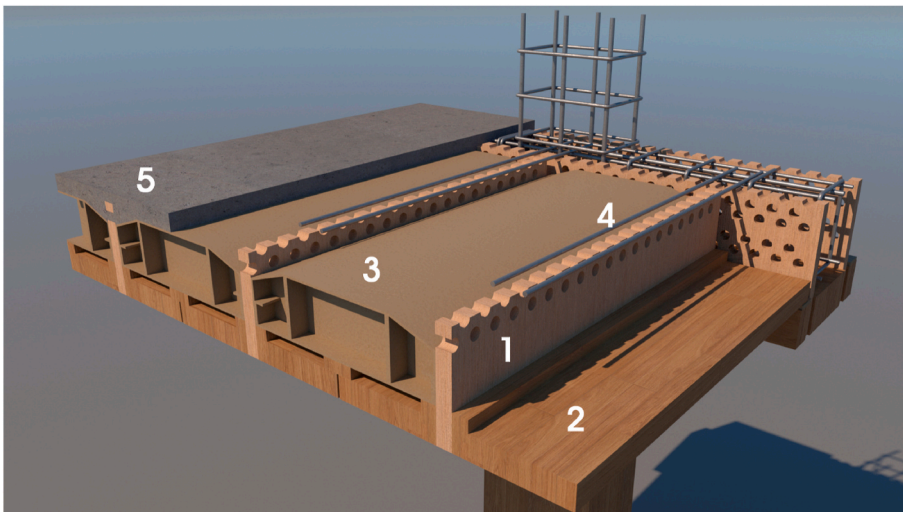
Three-dimensional model. Components of the flooring system: 1 plywood rib, 2 glulam flange, 3 in-fill blocks, 4 rebars, 5 concrete slab.
